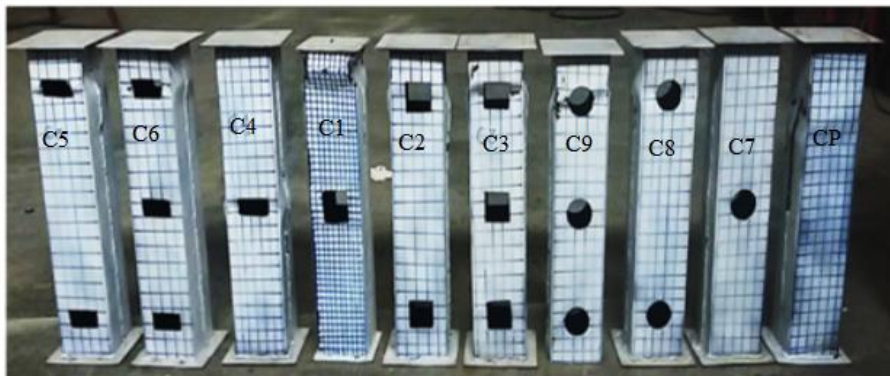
Steel columns with box section by Sadjad A. Al-Jallad and Haitham Al Thairy, 2016
